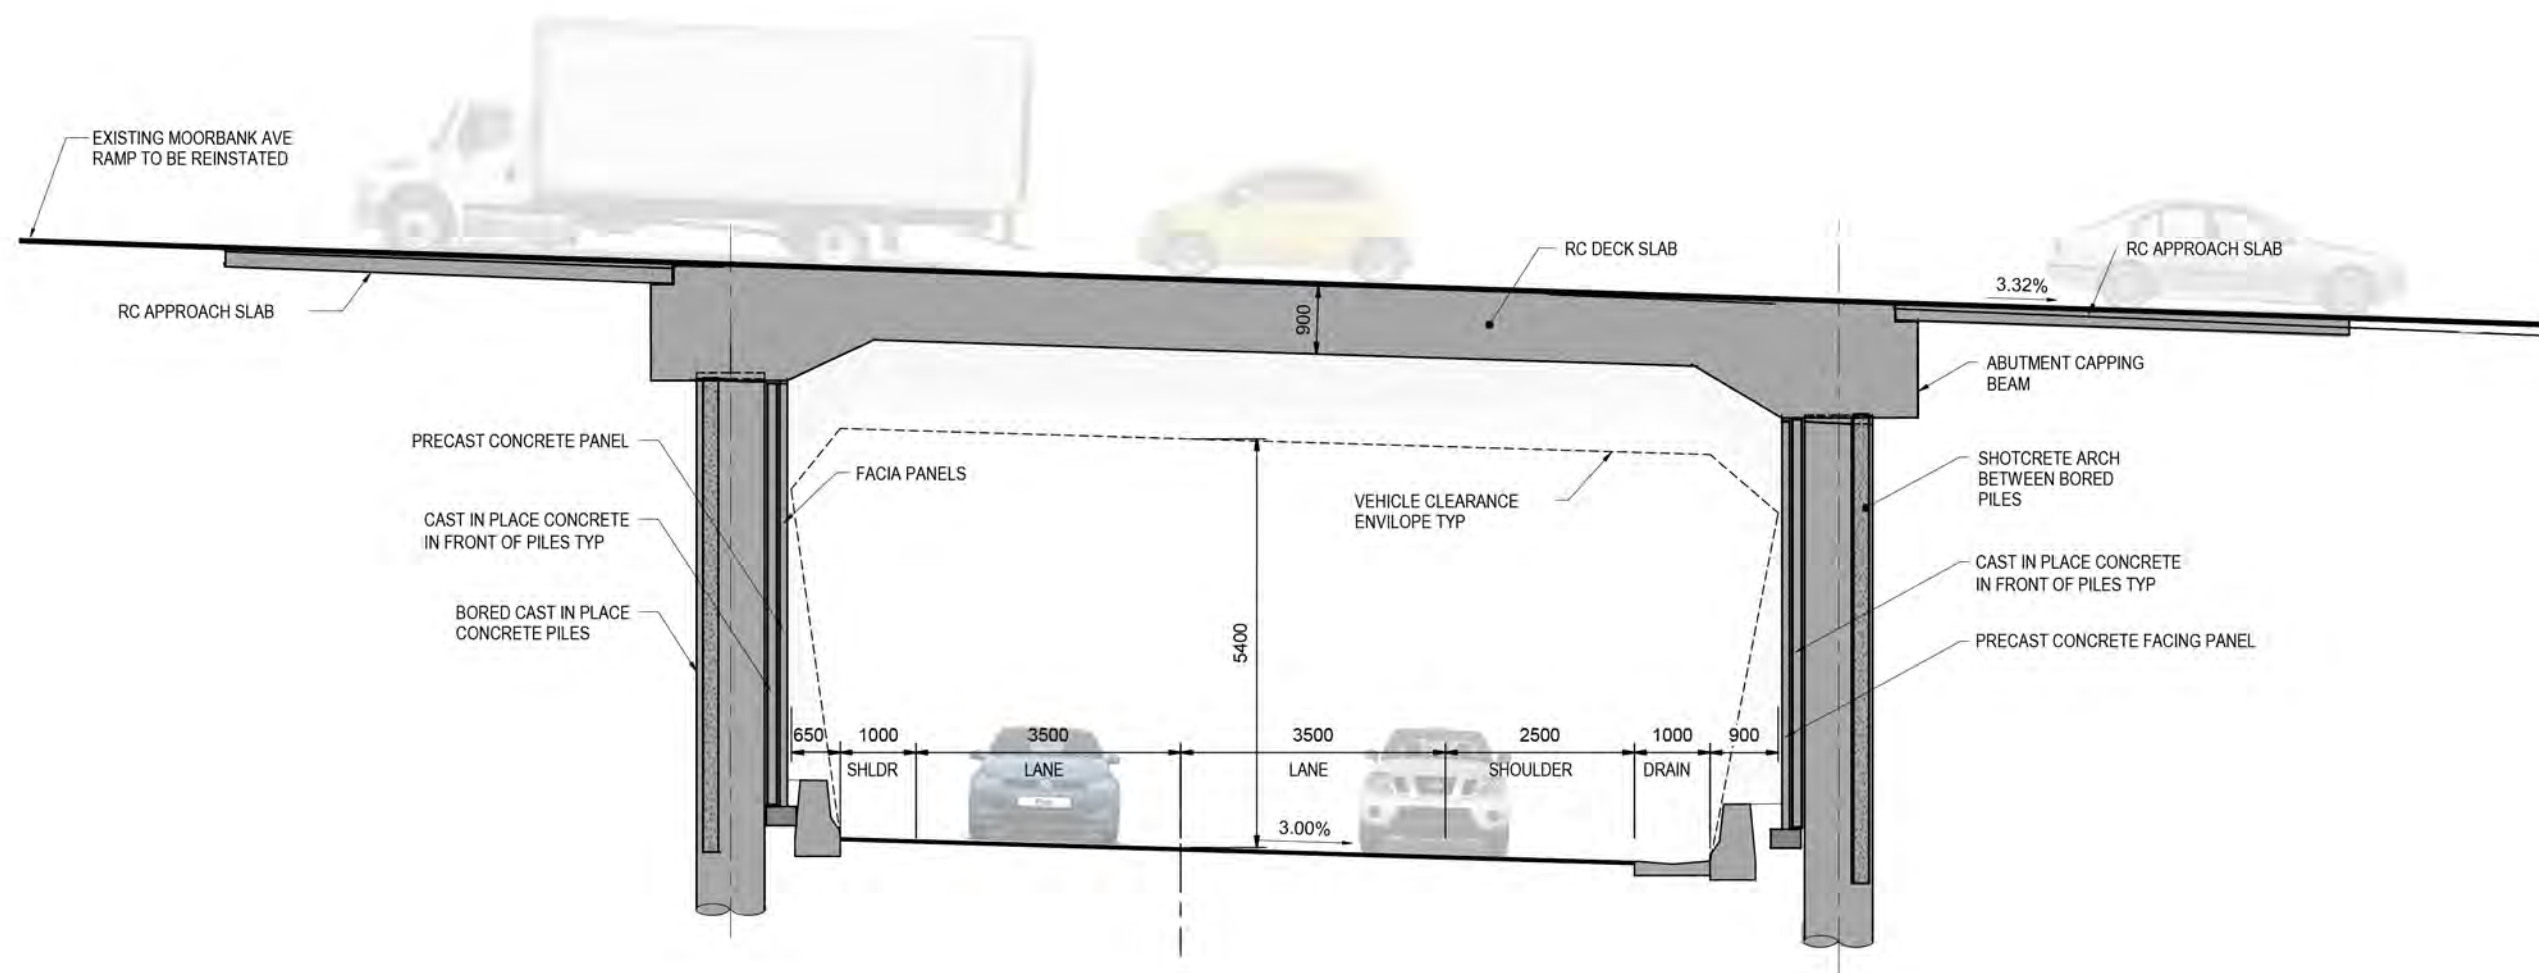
Cross section of the underpass at Moorebank Avenue. Scale 1:100
